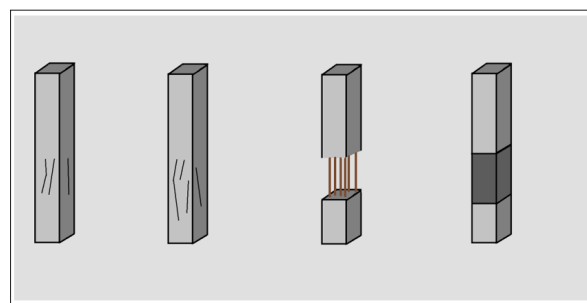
Shows the process of corrosion column reinforced concrete repair [17,18].
